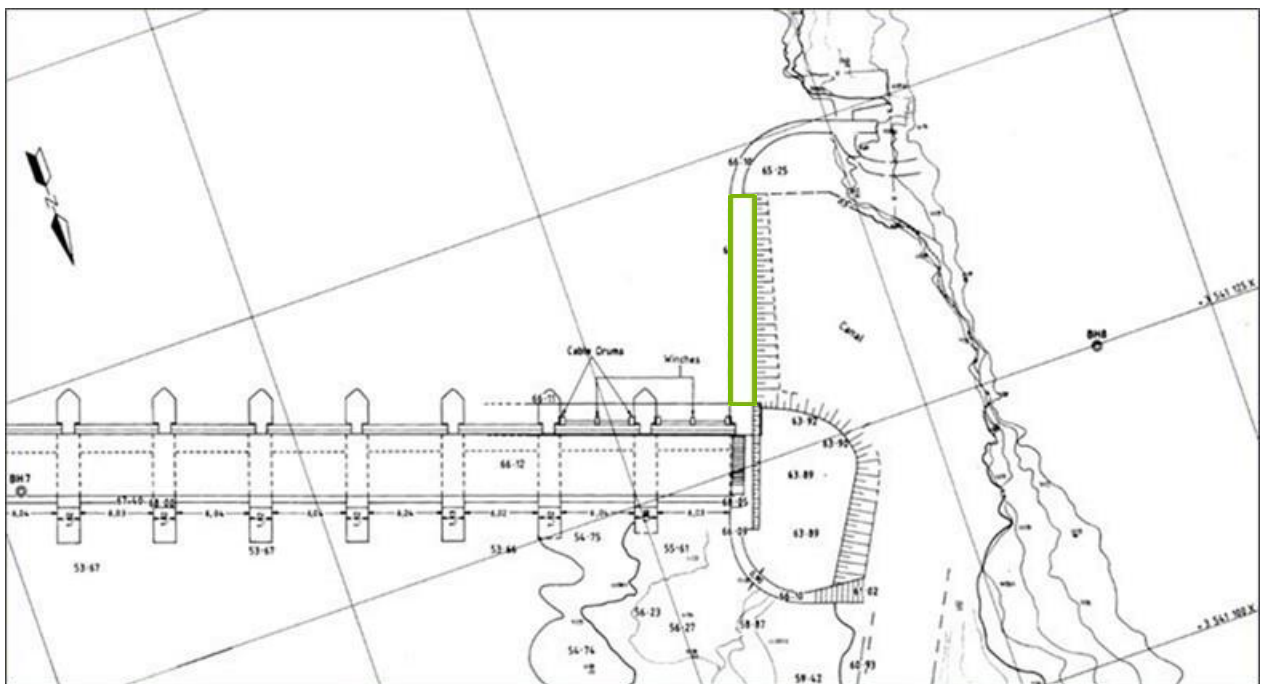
Plan view of Bulshoek Weir showing existing outlet structure (green)
